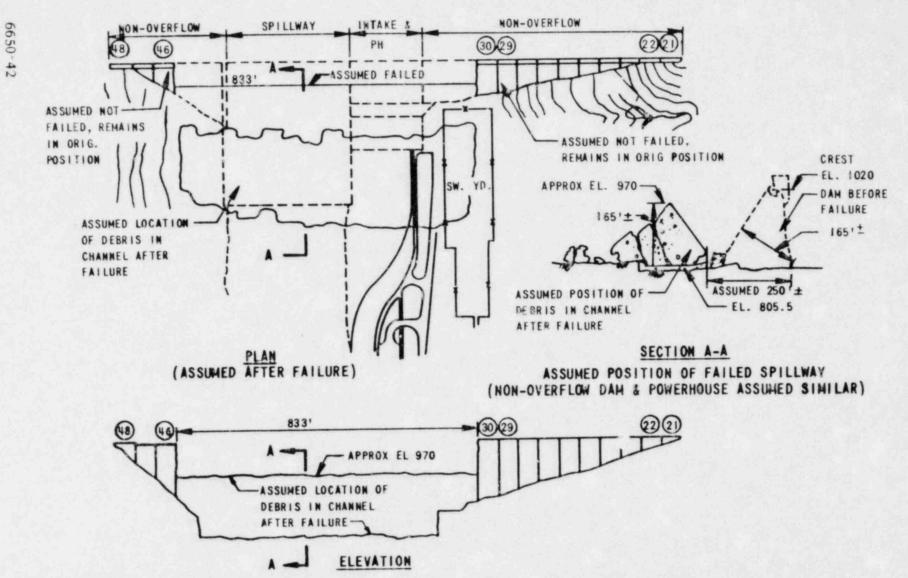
Norris Dam-SSE + 25 Year Flood Judged Condition of Dam After Failure
